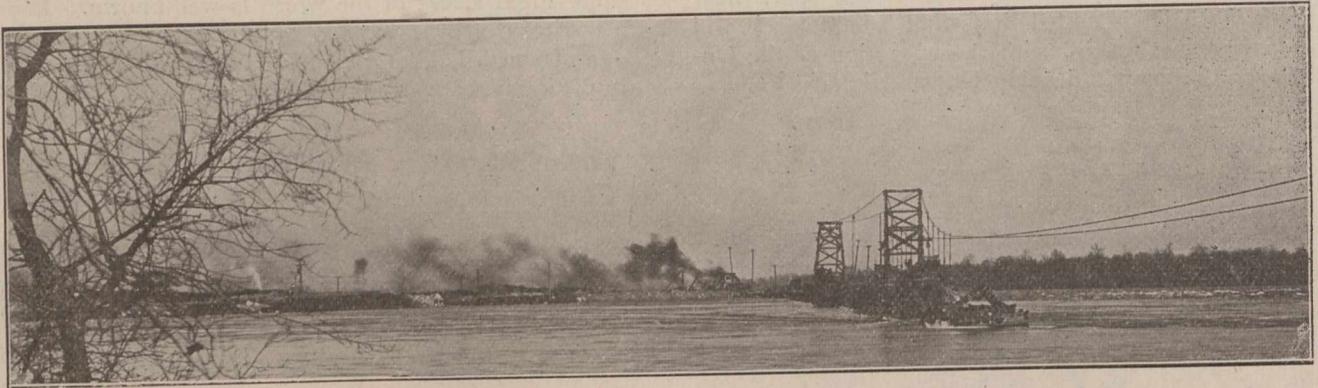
South Bank of Canal Under Construction, View from Isle-aux-Vaches.
